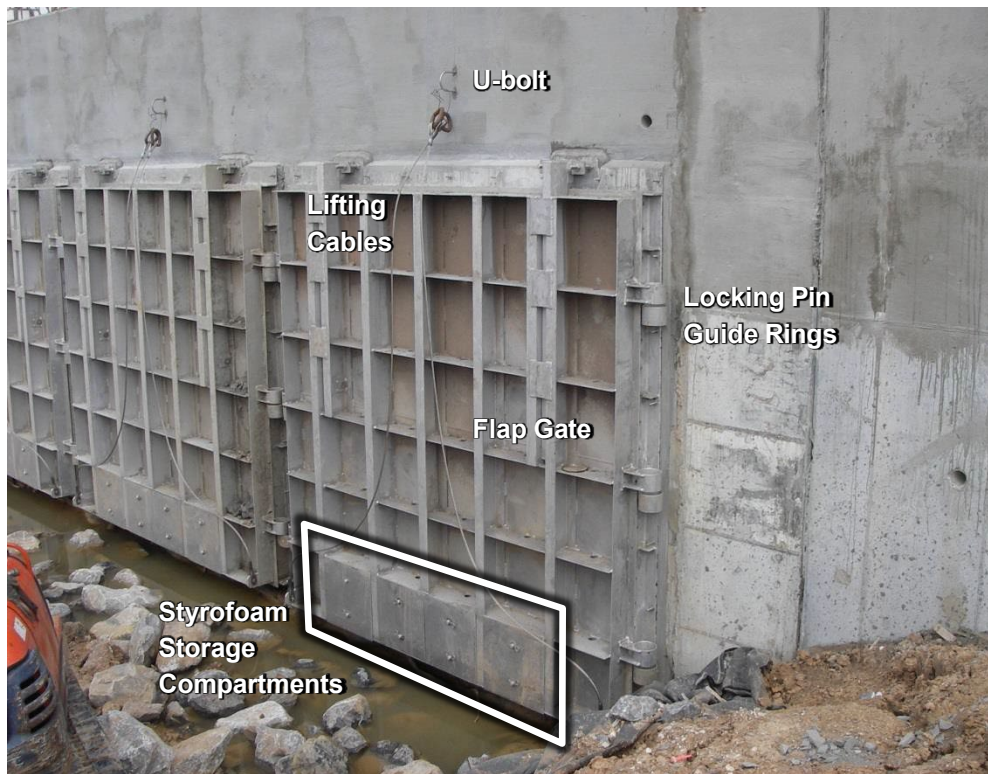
CS-29 Black Bayou Culverts - West Side/Outlet
